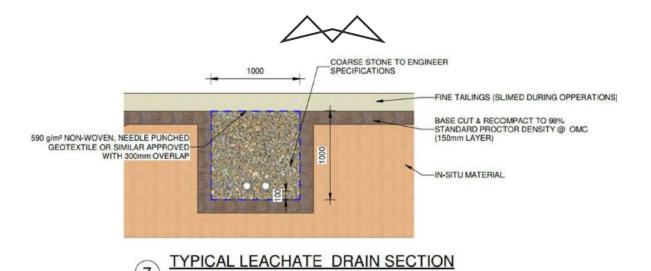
Typical Leachate Drain Detail (Eco Elementum, 2025)
